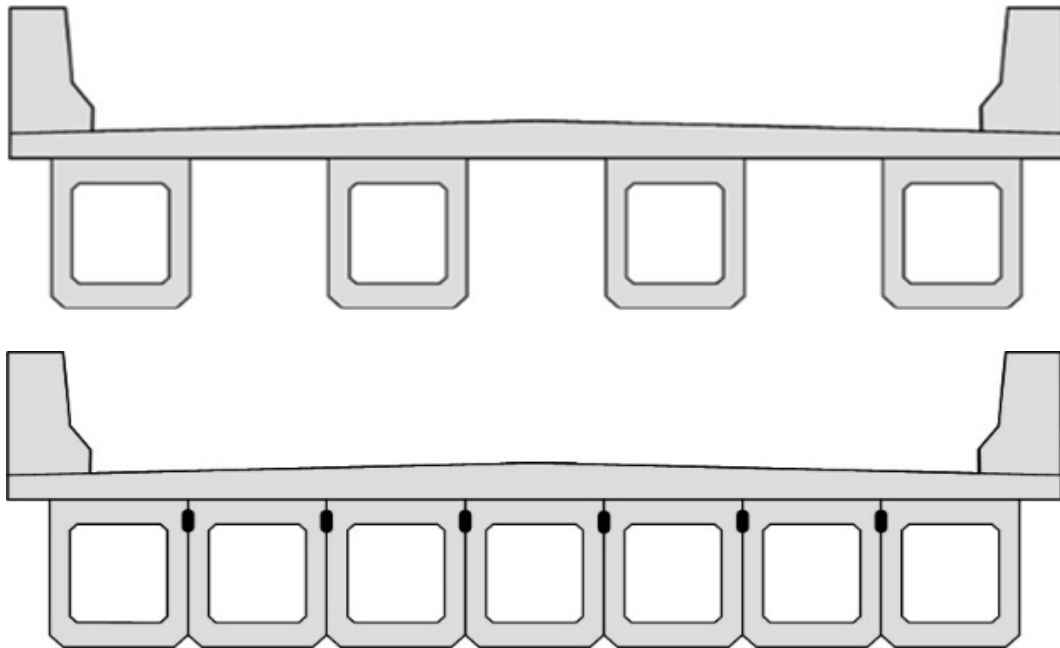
Cross Section - Prestressed Spread and Adjacent Box Beams
